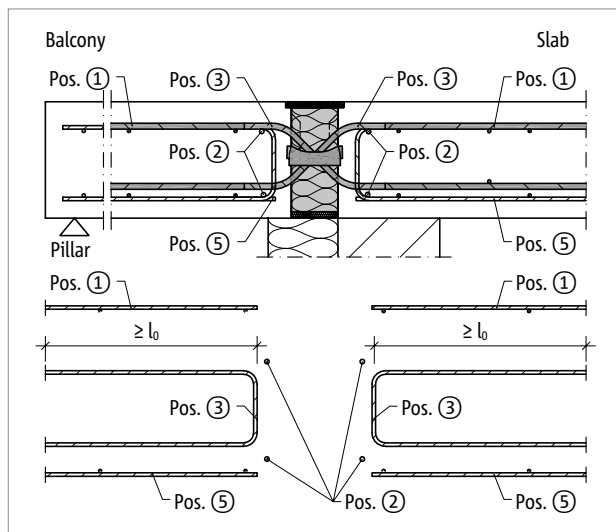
Schöck Isokorb® T type Q-E-VV: On-site reinforcement
